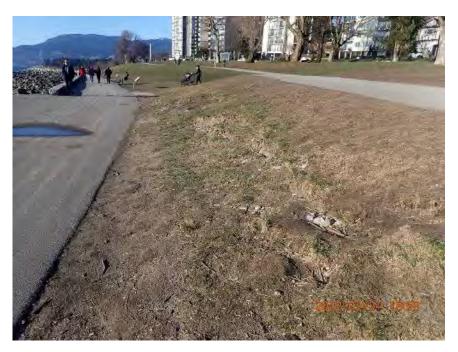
Between Paths - area of embankment erosion between west stairs and concrete pad to the east, approximately 10 m long.
